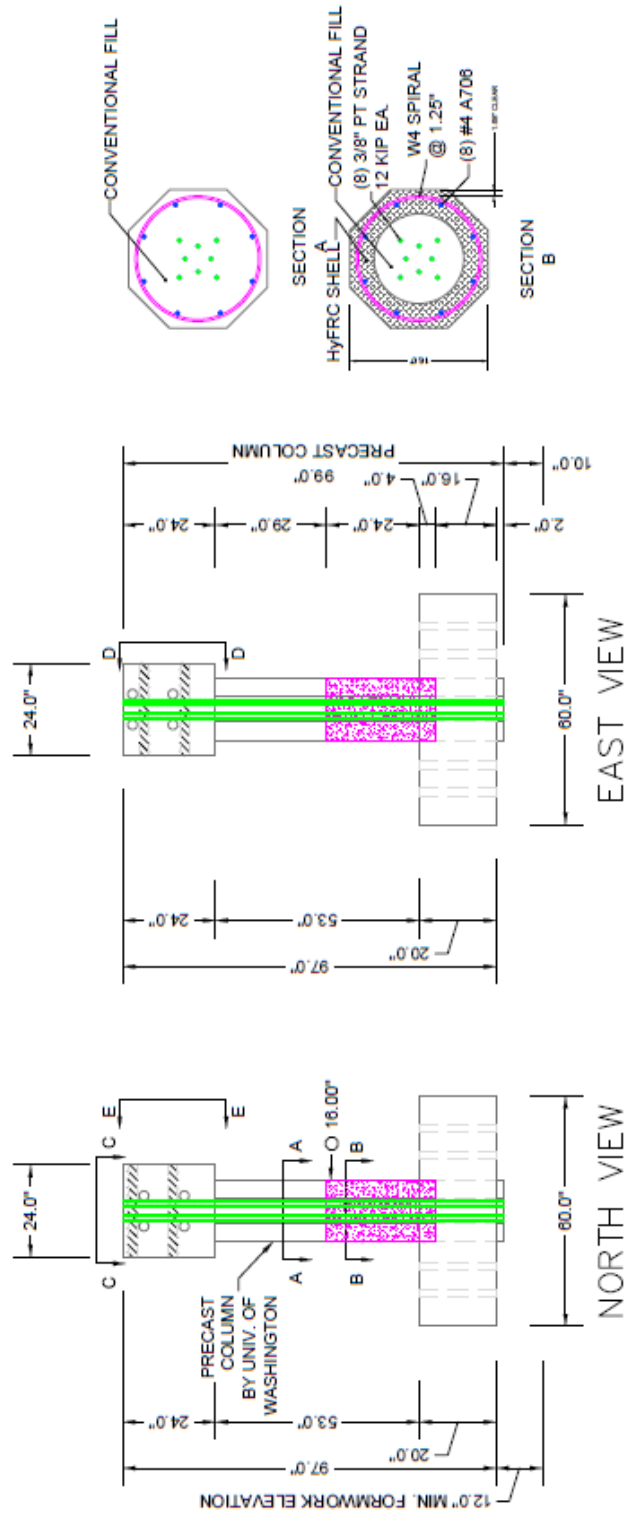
Unbonded pre-tensioned shake table specimen: elevation and cross-sections
